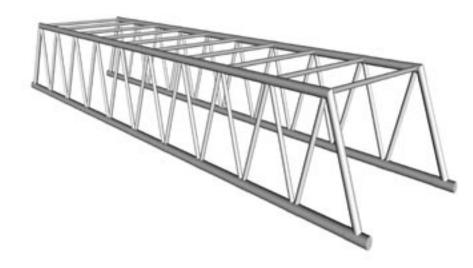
Tubular Truss Framing for Hood Canal Floating Bridge
